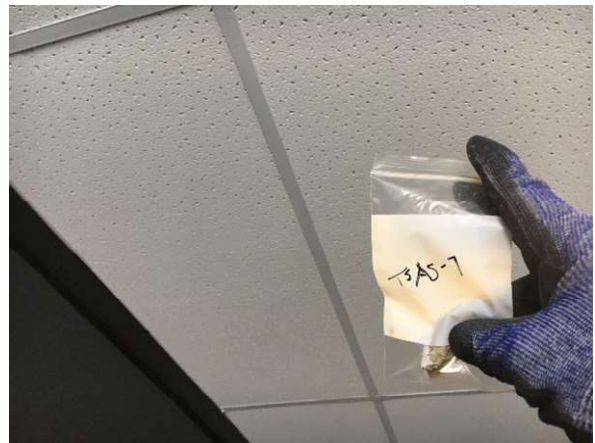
HA46: White 2'x4' ceiling tile with small widely spaced gouges, not asbestos containing
